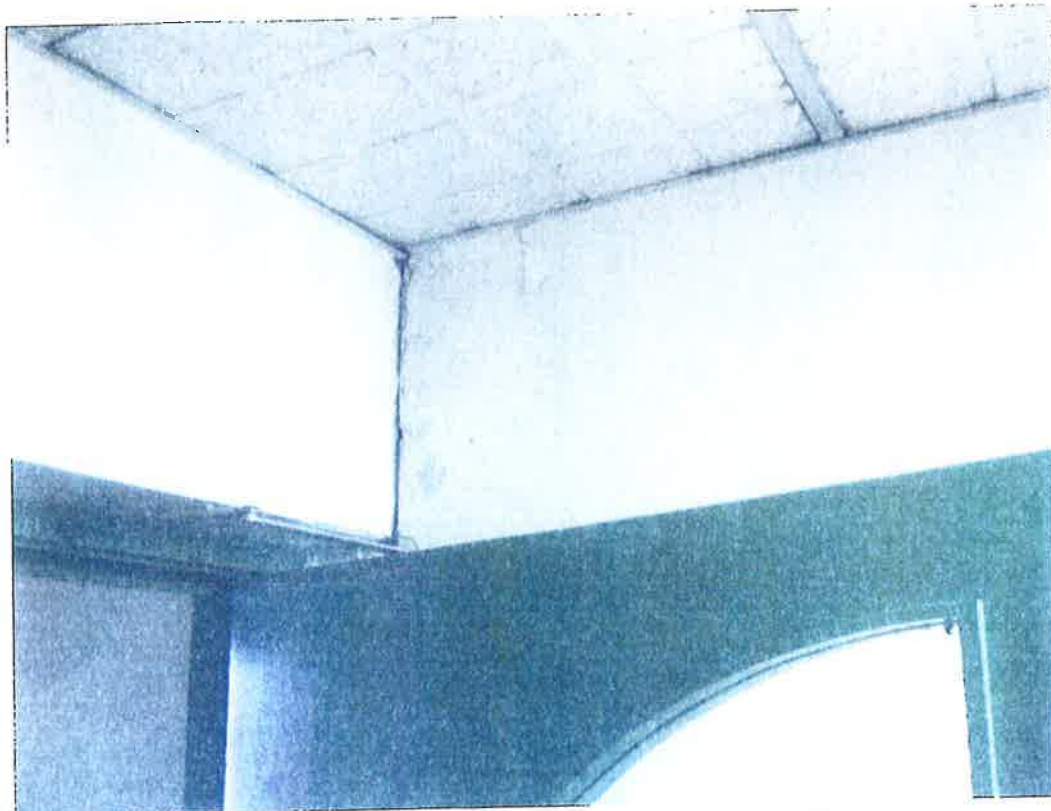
Partition lining damaged at junction with concrete beam.
